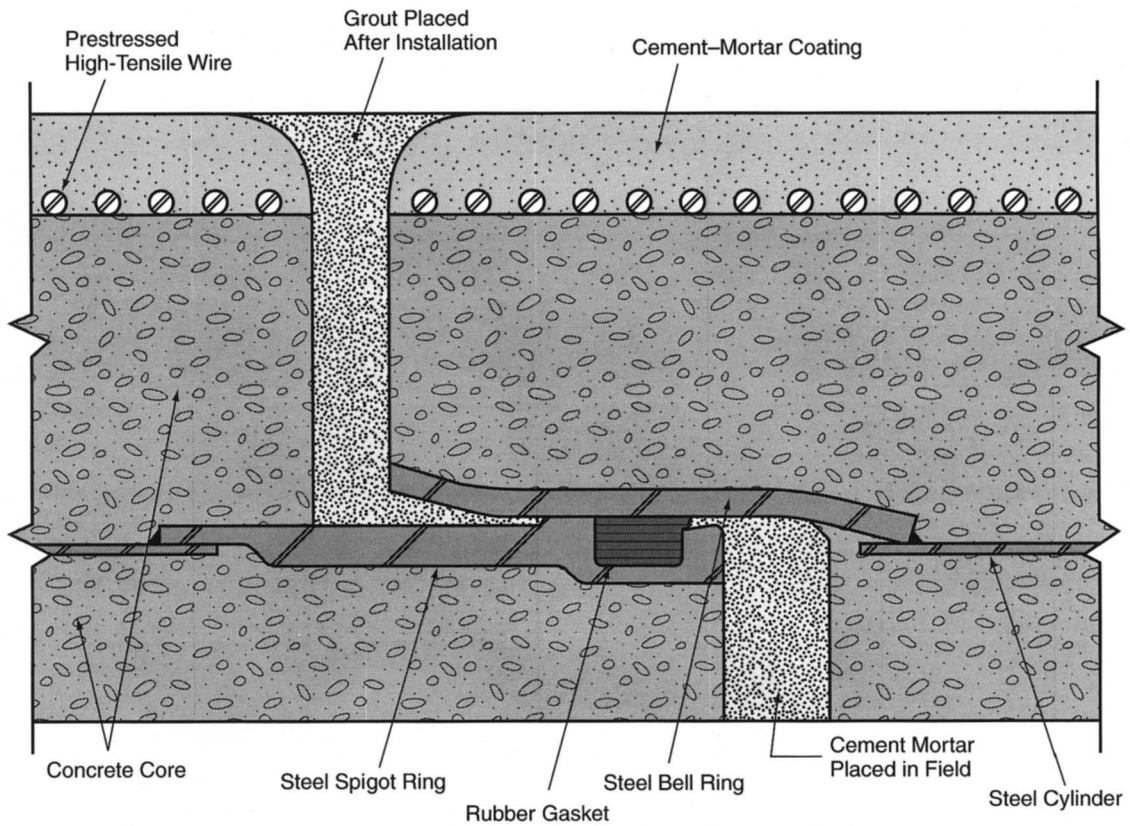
Prestressed concrete embedded cylinder pipe (AWWA C301-type pipe)
